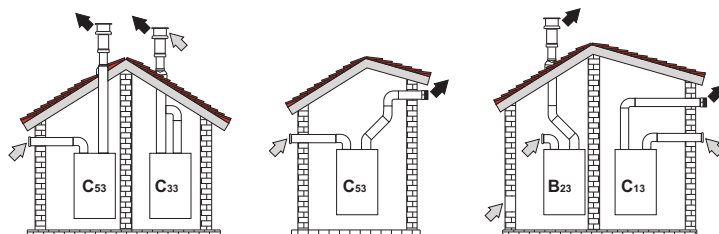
Examples of connection with separate pipes (→ = Air / → = Fumes)
